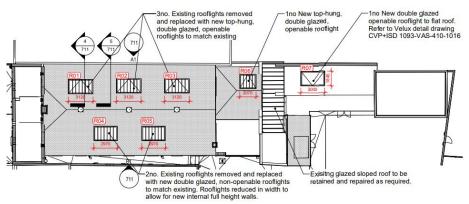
Extract of Proposed Roof Plan showing location of all rooflights
